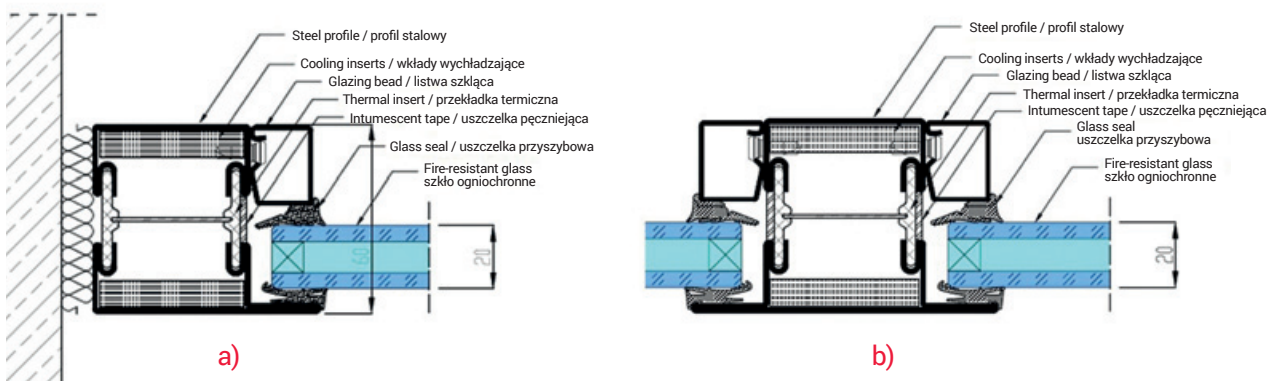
Cross-section of external (a) and internal (b) steel construction connections
